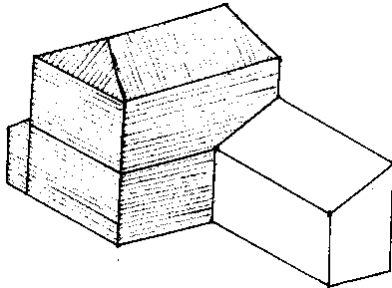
Multi-storey dwelling houses. Principal building form shown hatched.
